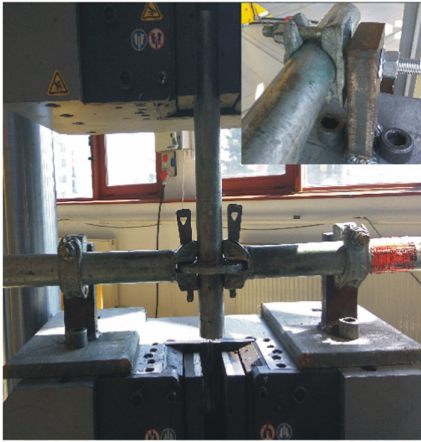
Specimen of the joint between ledgers and standard on the test rig.
